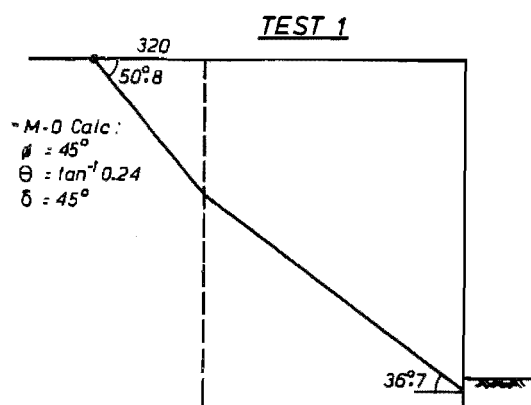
Failure geometry, test 1. Wall final position not measured.
